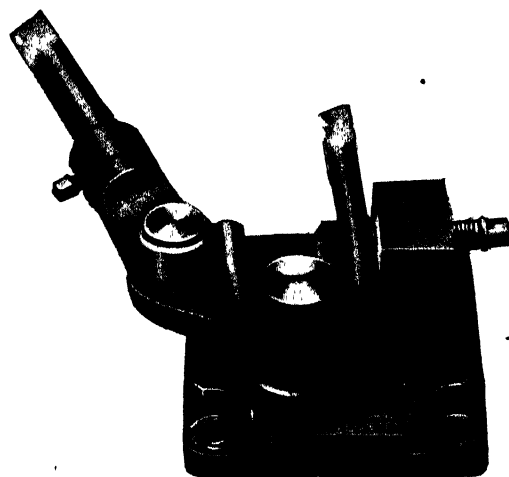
SINGLE-LEVER BAR-BENDING MACHINE, FOR BARS UP TO 1 IN. DIAMETER
